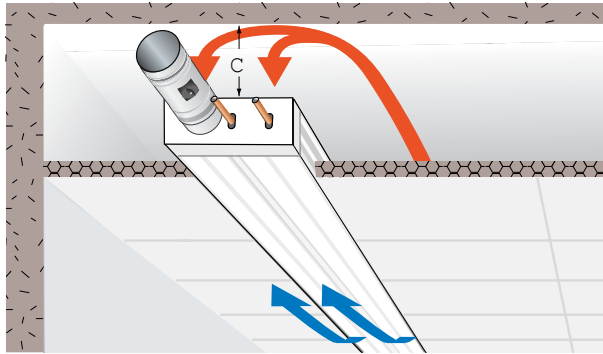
Installation dimensions when the room air reaches Podium from another opening in the suspended ceiling.
